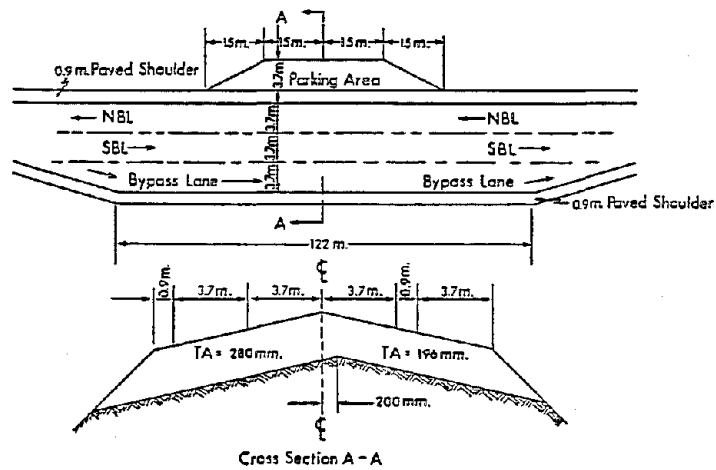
Plan and cross section of Alberta Research Council test section. [10]
